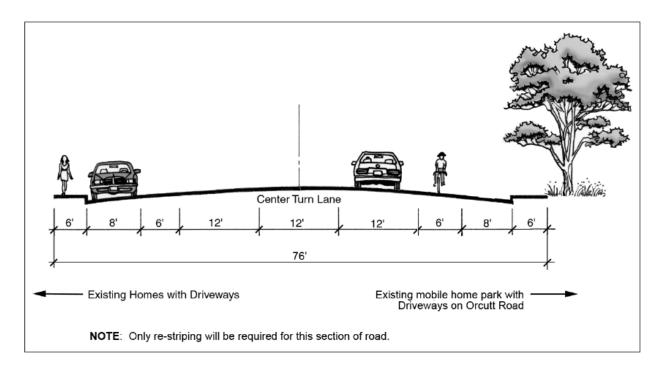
B ORCUTT ROAD FROM FERNWOOD DRIVE TO JOHNSON AVENUE AT CULVERT/CREEK CROSSING OR SLOPES OVER 1:4
